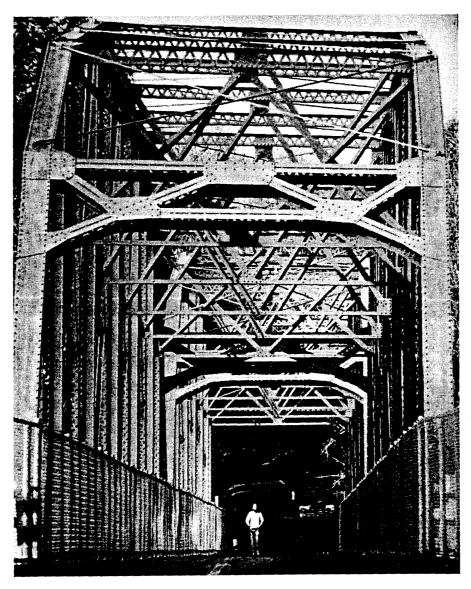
Old Fair Oaks Bridge, view from the south looking north, March 18, 1978, Sacramento Bee Photo Morgue, accession #SBPM 1101, Sacramento Archives and Museum Collection Center, Sacramento, California.
